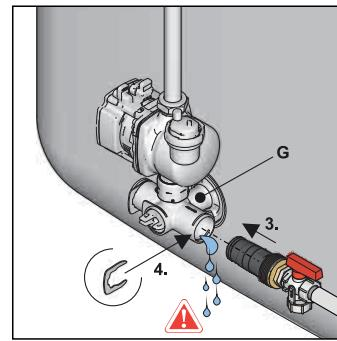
Assembling the KFE filling connection in the connecting elbow
